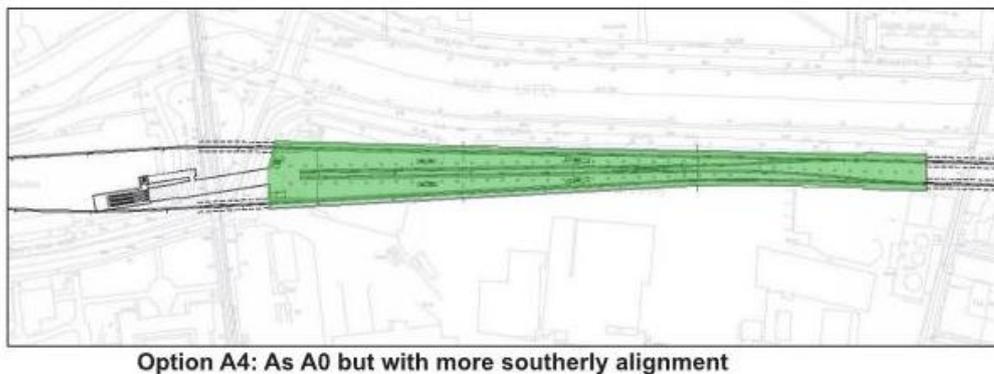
Heuston Plan A with Cut and Cover Station in St. James' Gate Brewery
